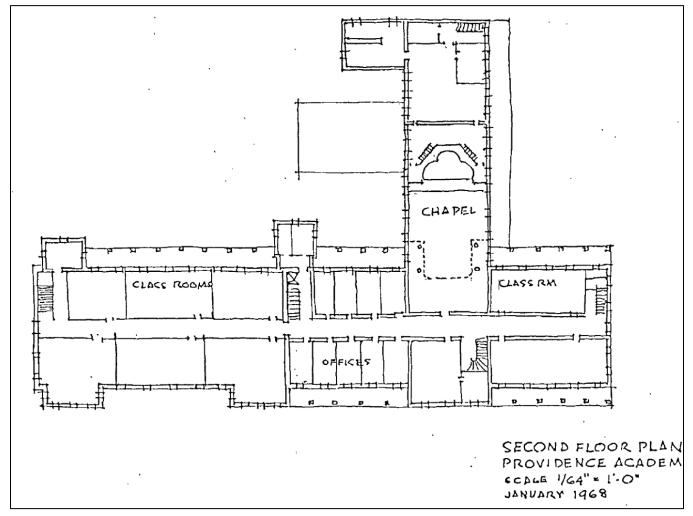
<u>House of Providence second floor plan in 1968 (Lentz, "House of Providence, Vancouver, Washington," Supplemental materials).</u>
